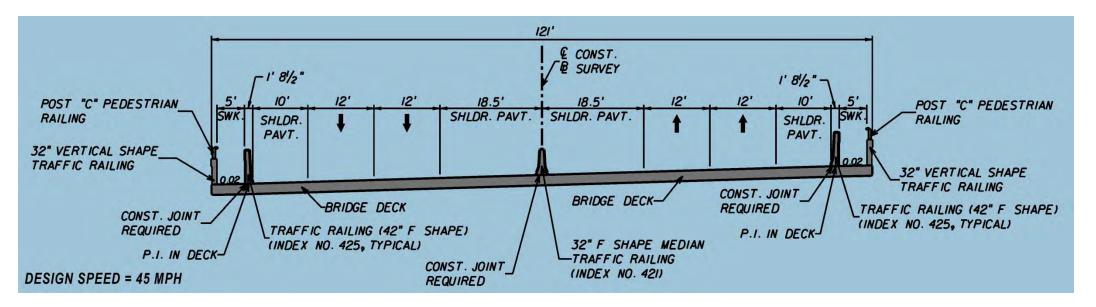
Proposed Typical Section-East Alignment, Parallel to the Ibis Preserve
